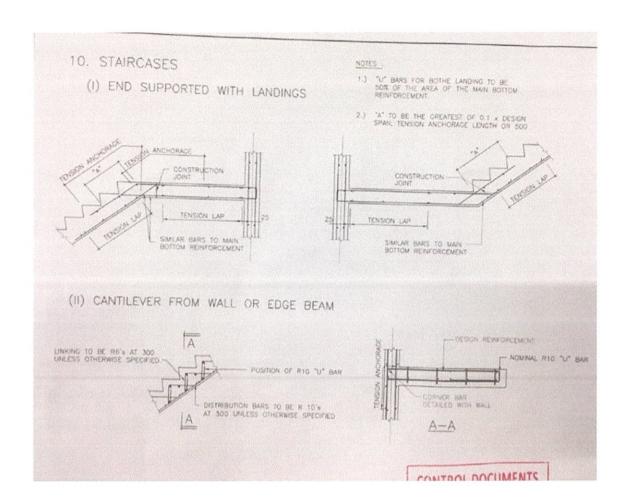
Construction Drawing at Public drawing Source: WZR SDN BHD
